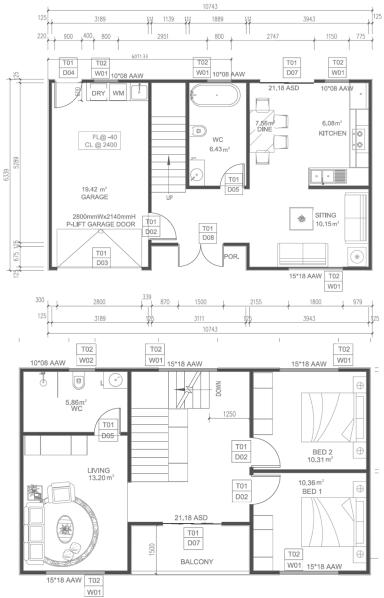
Extract from Floor Plans – 4 x Rear Units (Prepared by T. Tran)
